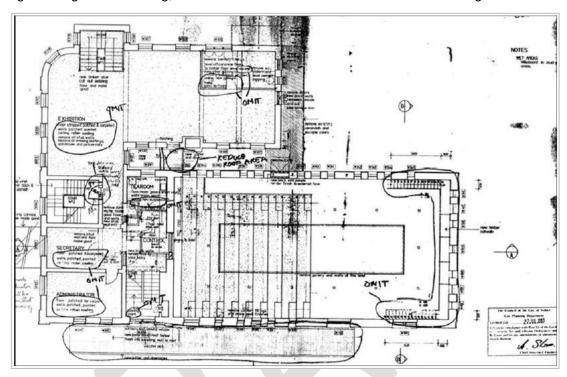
Amended First Floor plan, approved in 1983, showing the proposed amendments or "omissions". (Source: City of Sydney Archives 539/1/82)
